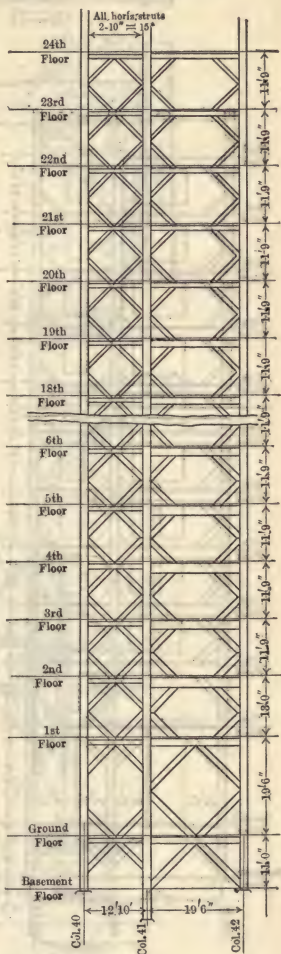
Whitehall Building. Wind-bracing on Line II, Fig. 10
